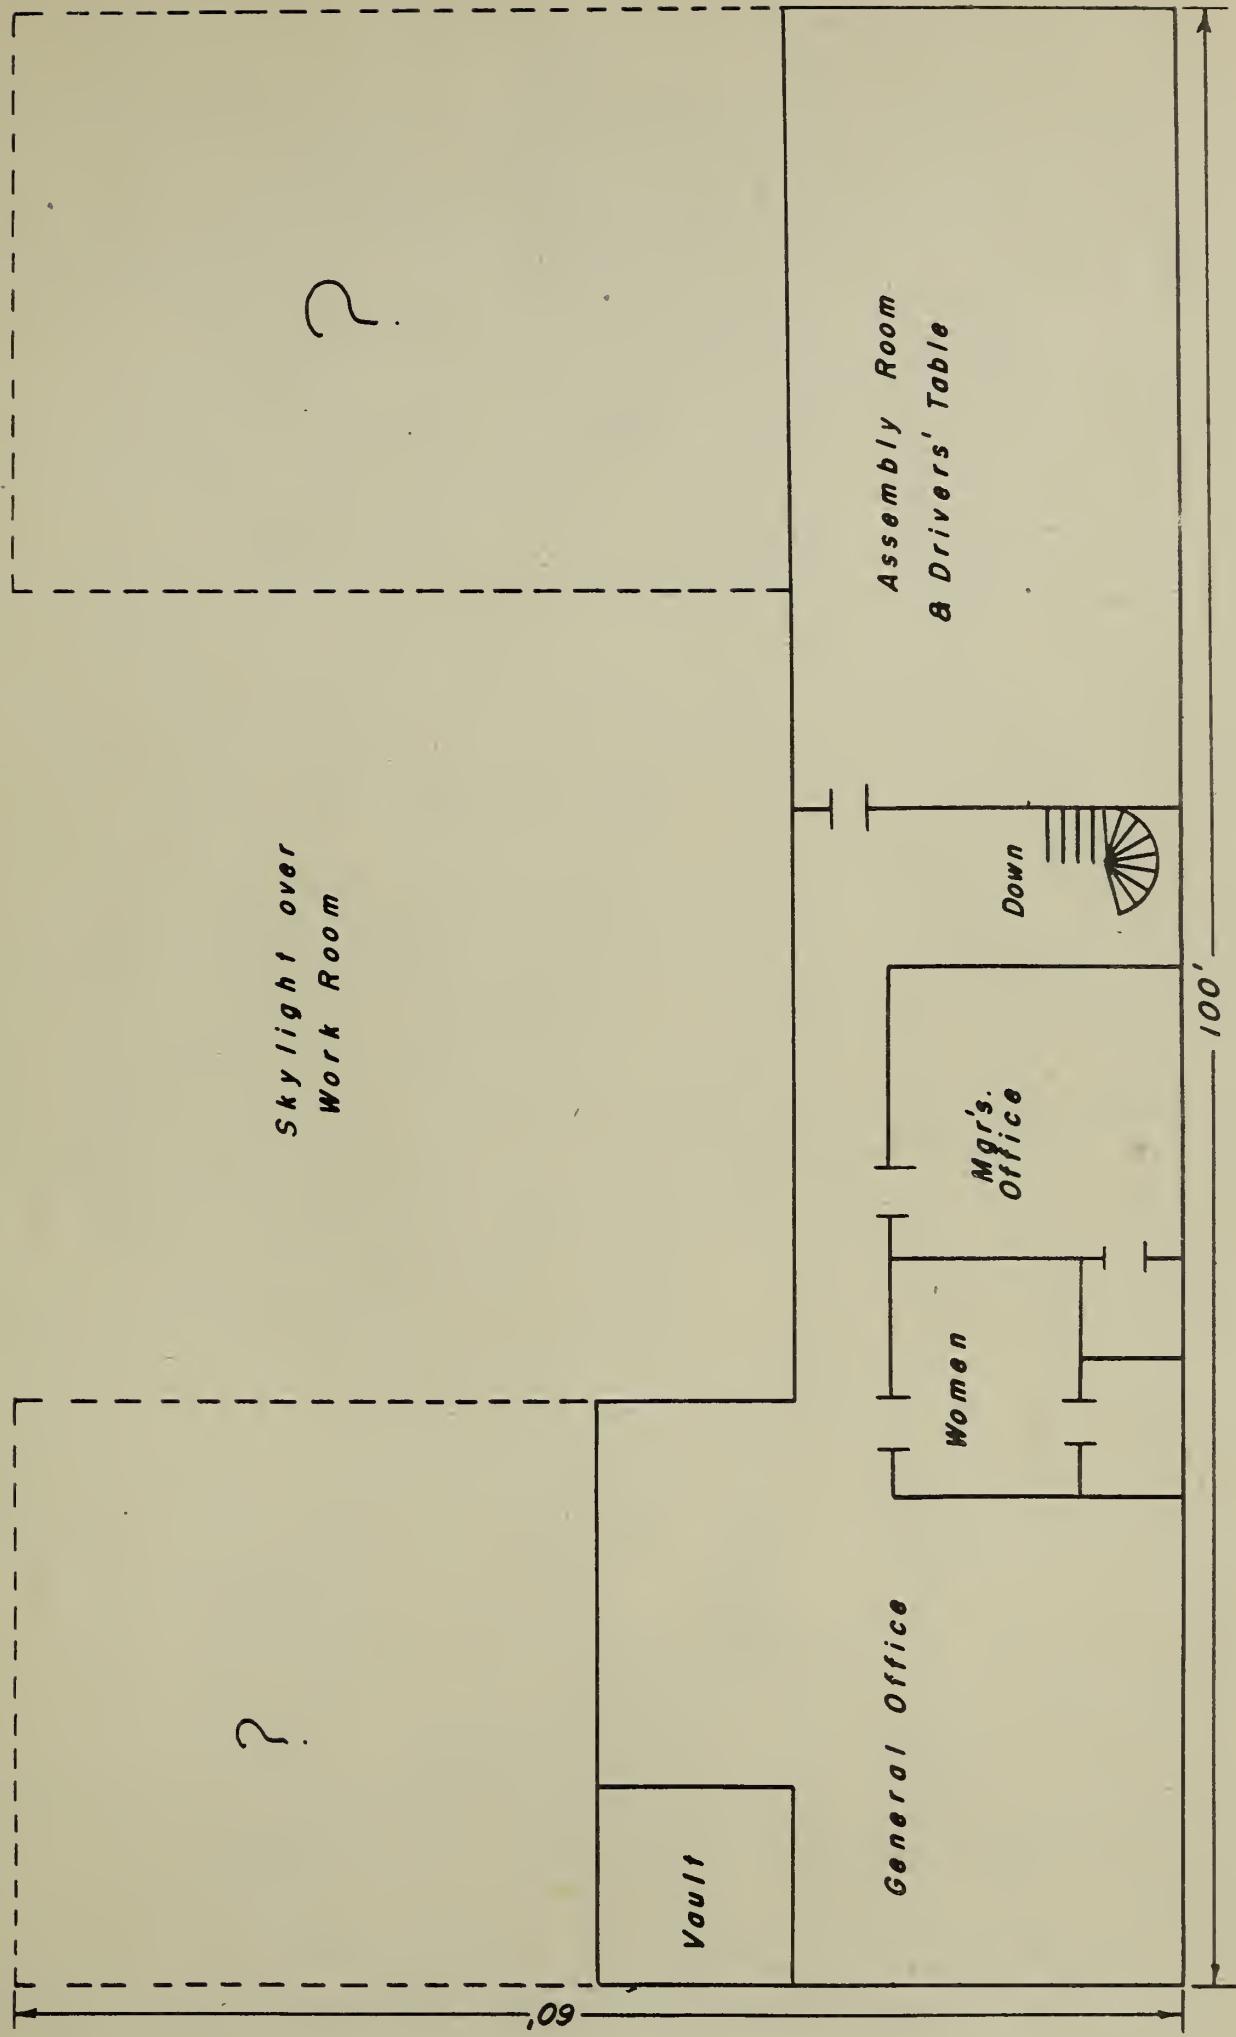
Proposed floor plan for pasteurizing plant. (Second floor.)
